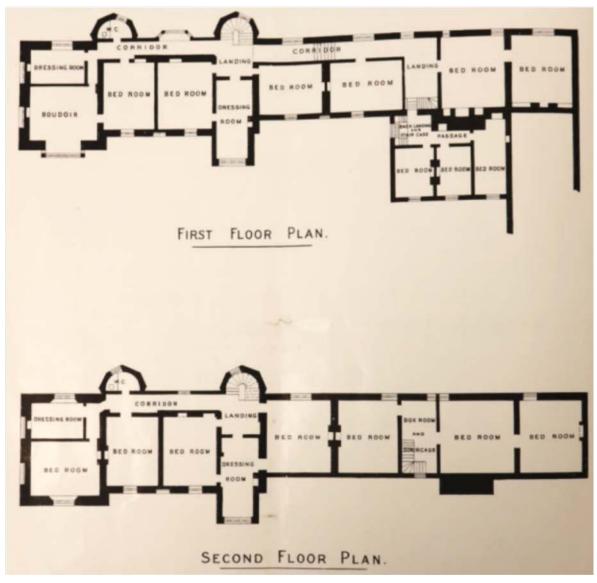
First and second floor plans of the house as part of sales particulars, 1900 (BA5723 ref705.550)
